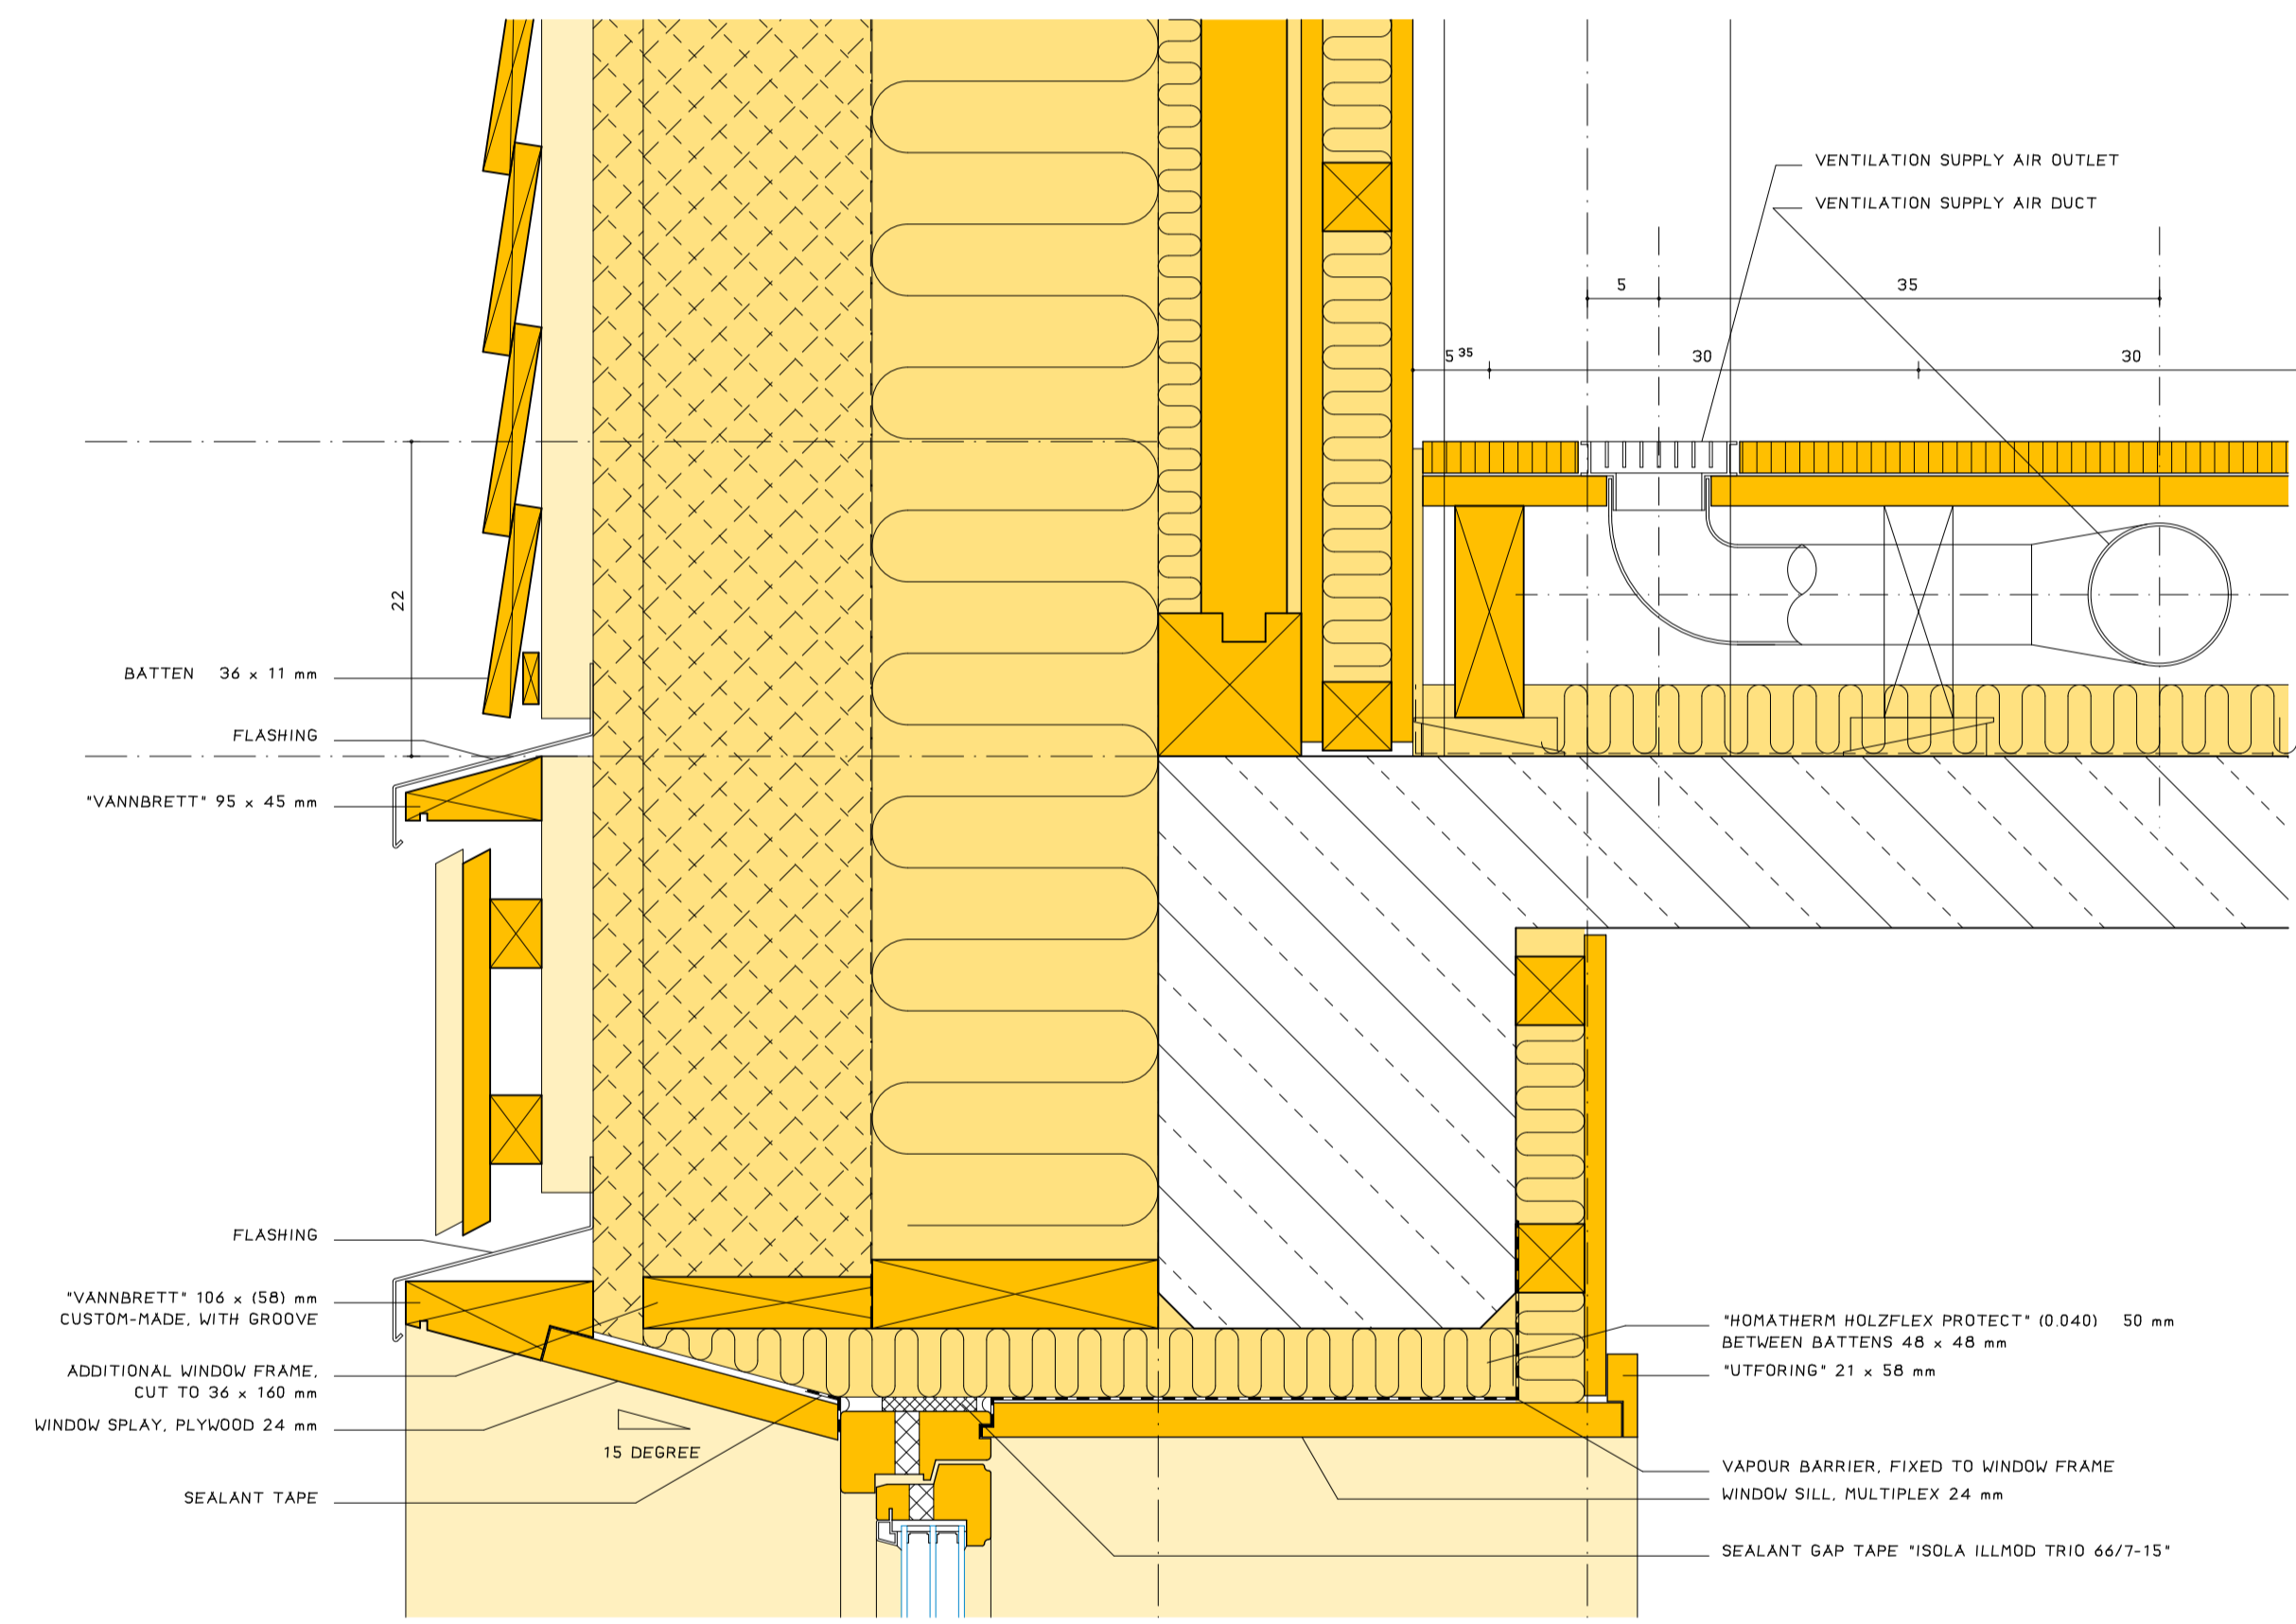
DETAIL WINDOW JAMB FIRST FLOOR 1 : 10
